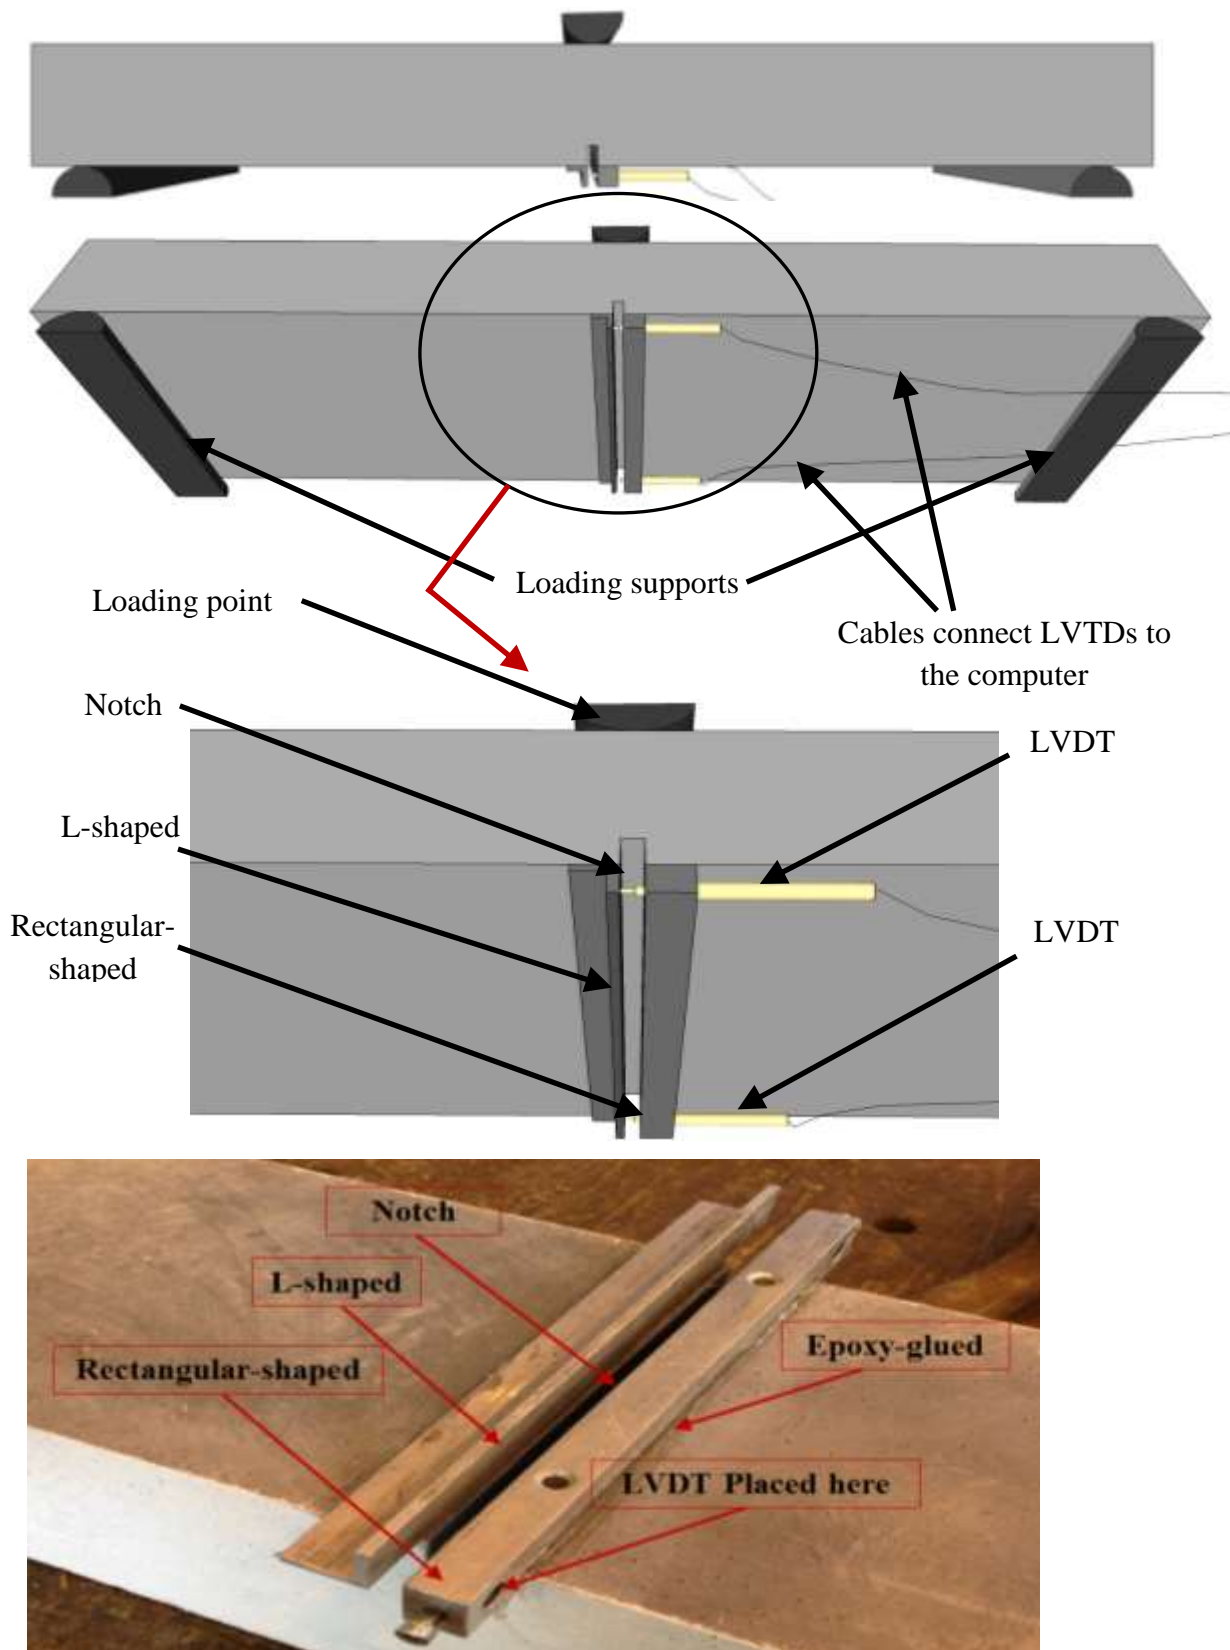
Beam specimen set-up showing the LVDT positions.
